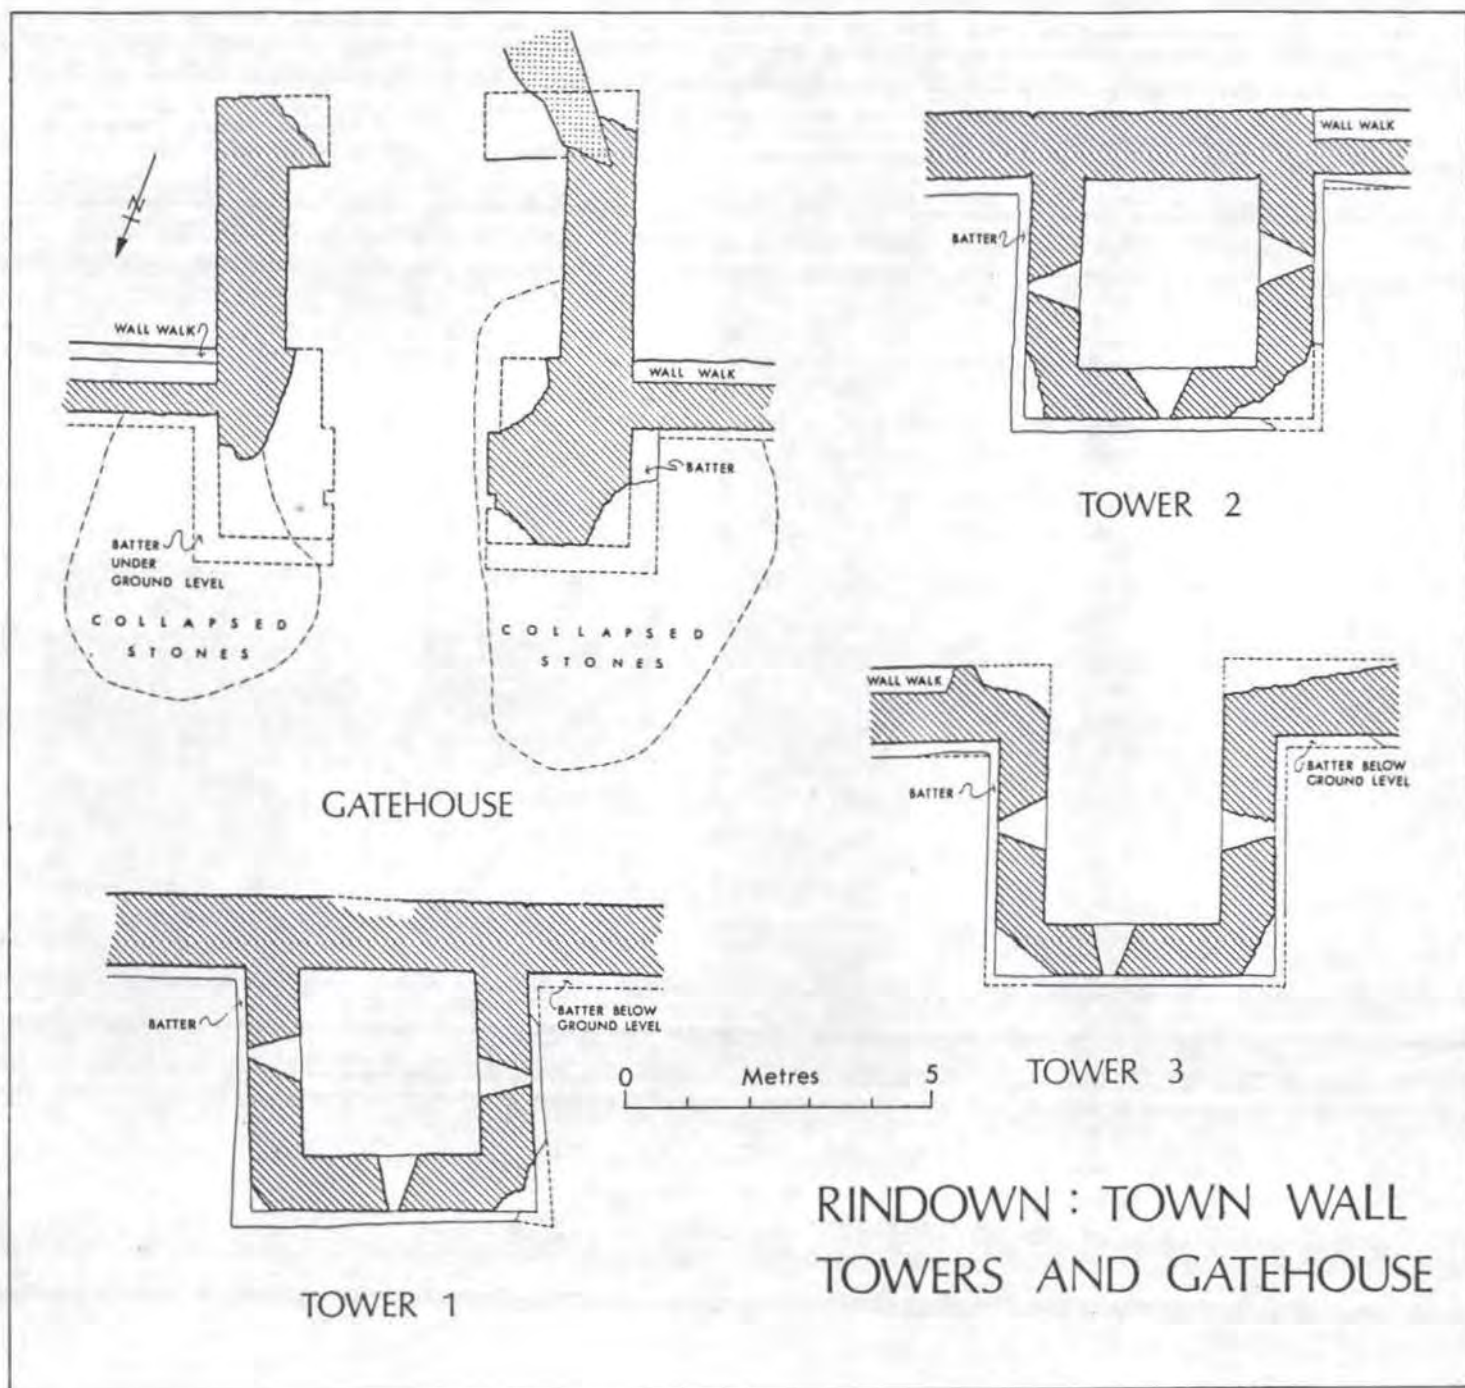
Rindown: ground plans of the town wall mural towers and of the gatehouse.
